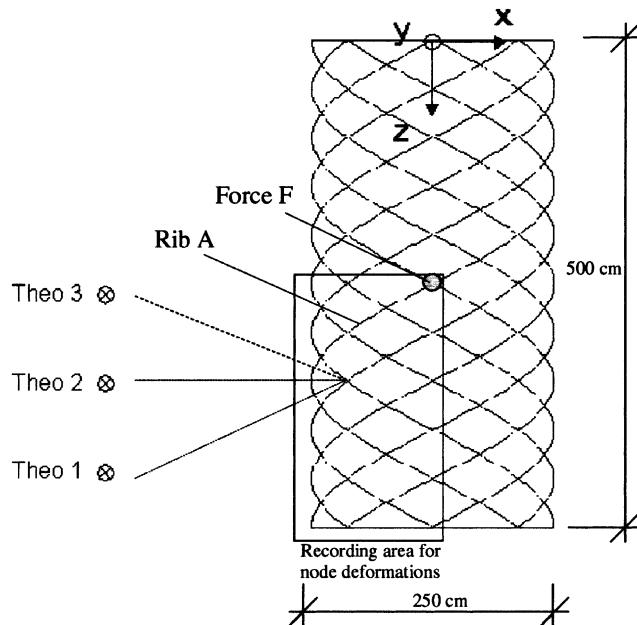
Loading and deformation measurements on a plan view of the test cross-ribs.
